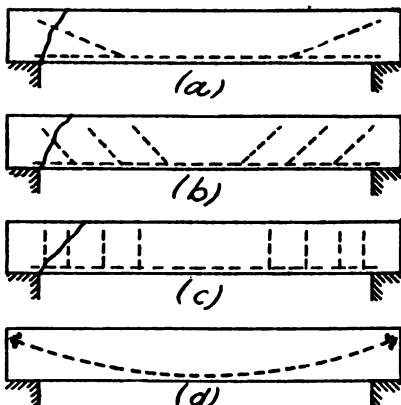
SHOWING SEVERAL METHODS OF REINFORCING BEAM FOR SHEAR.
